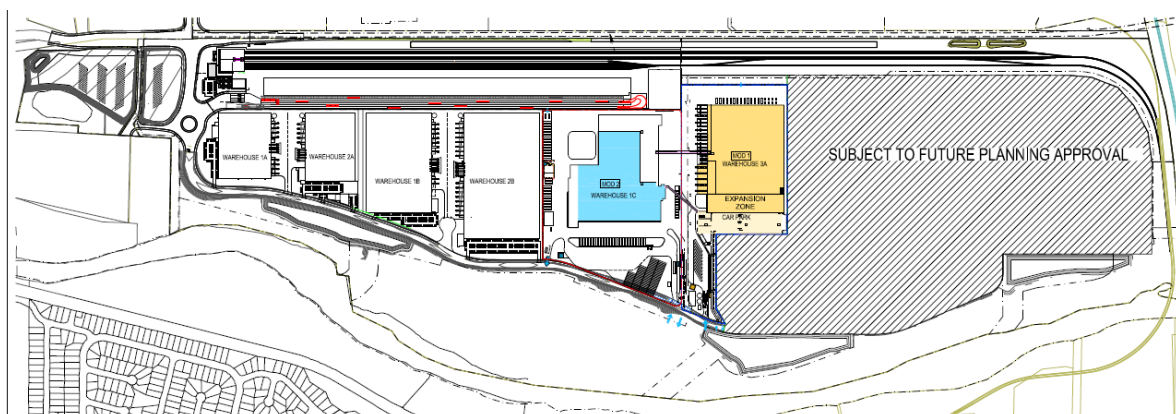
Drawing No. JK-SK-A-A-9402 (Rev S3) – Precinct Modification Plan Proposed, prepared by Bell Architecture dated 28 November 2019
